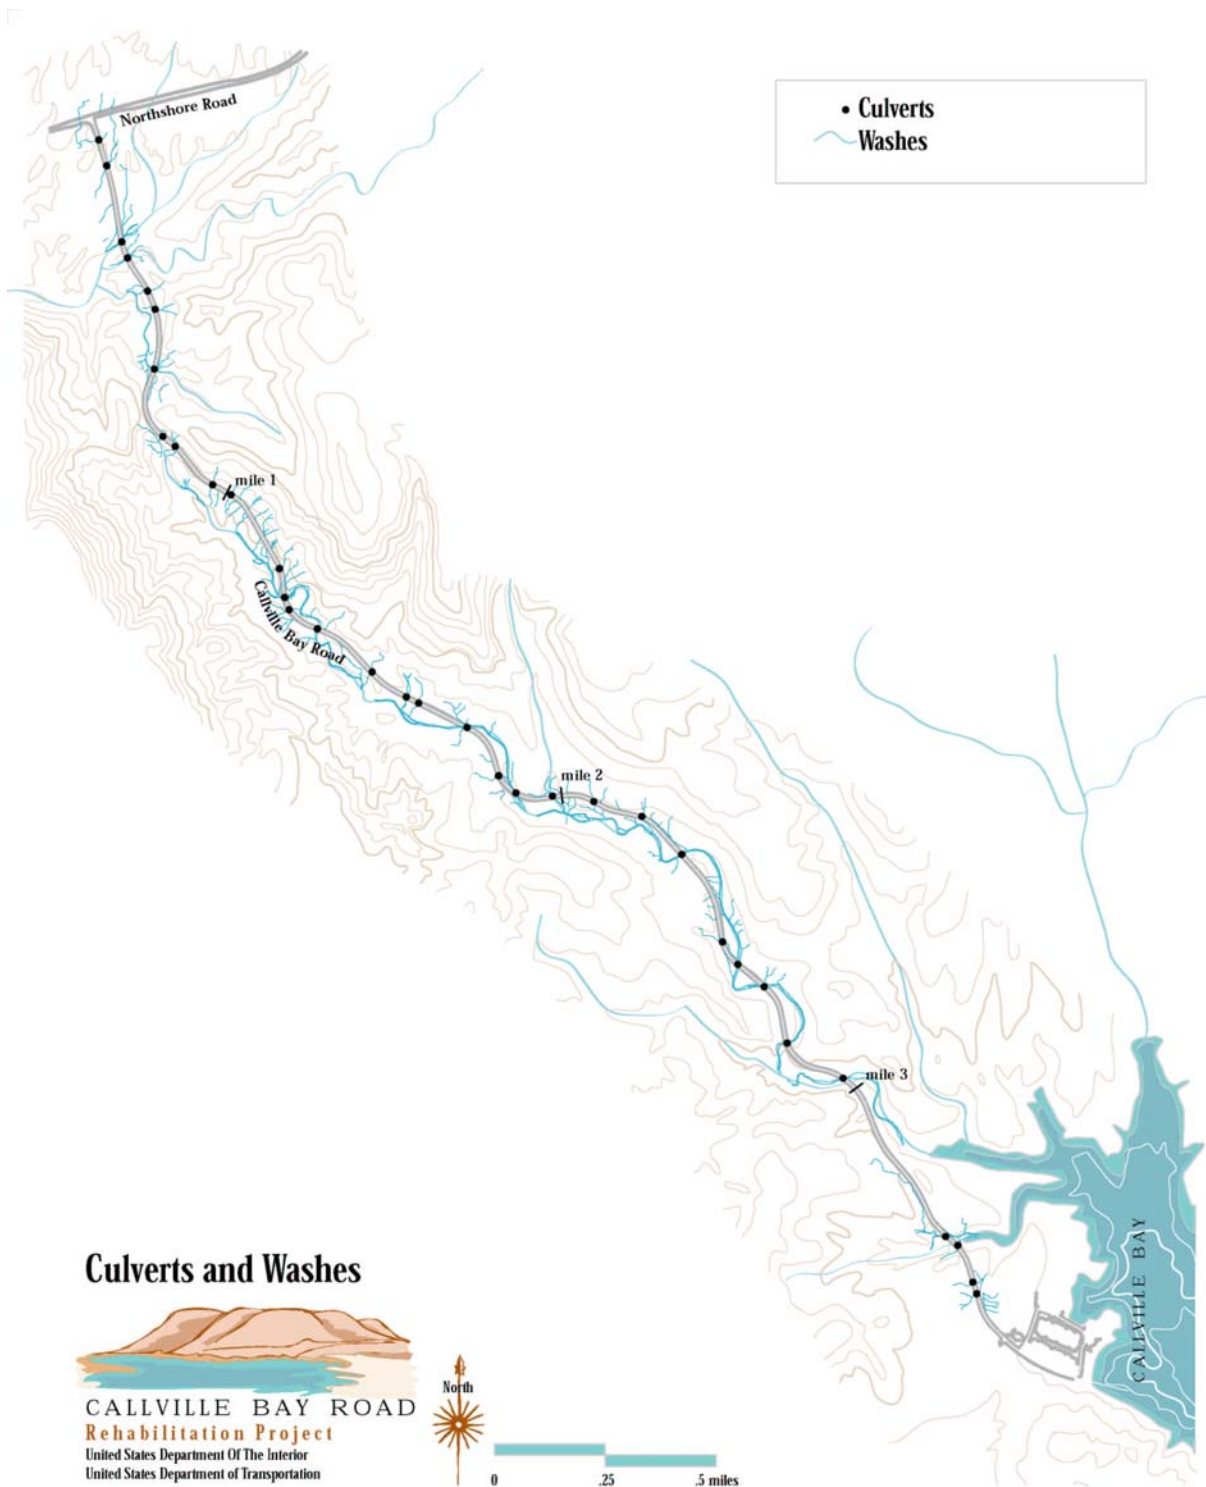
CULVERTS AND WASHES ALONG CALLVILLE BAY ROAD
